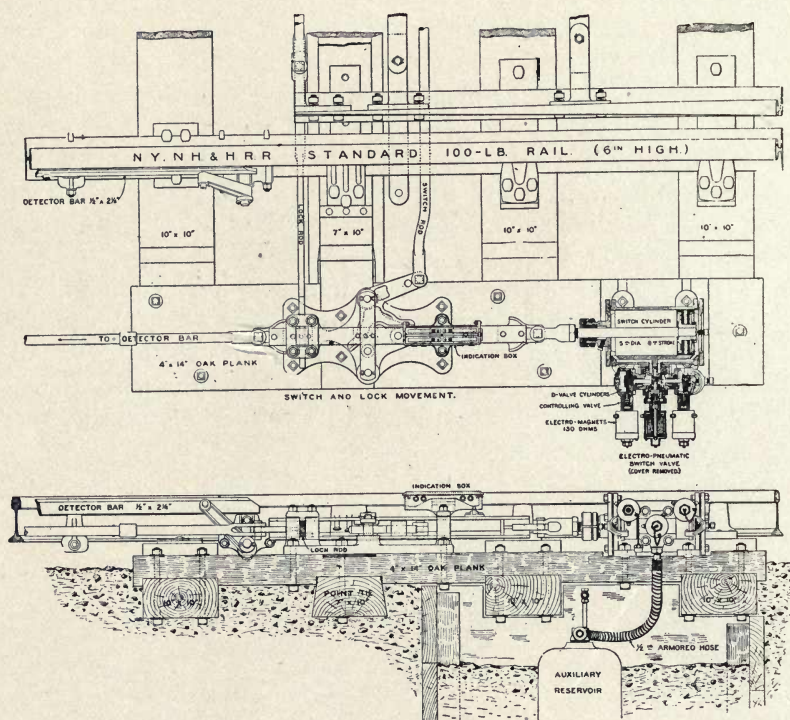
PLAN AND ELEVATION OF SIMPLE SWITCH
